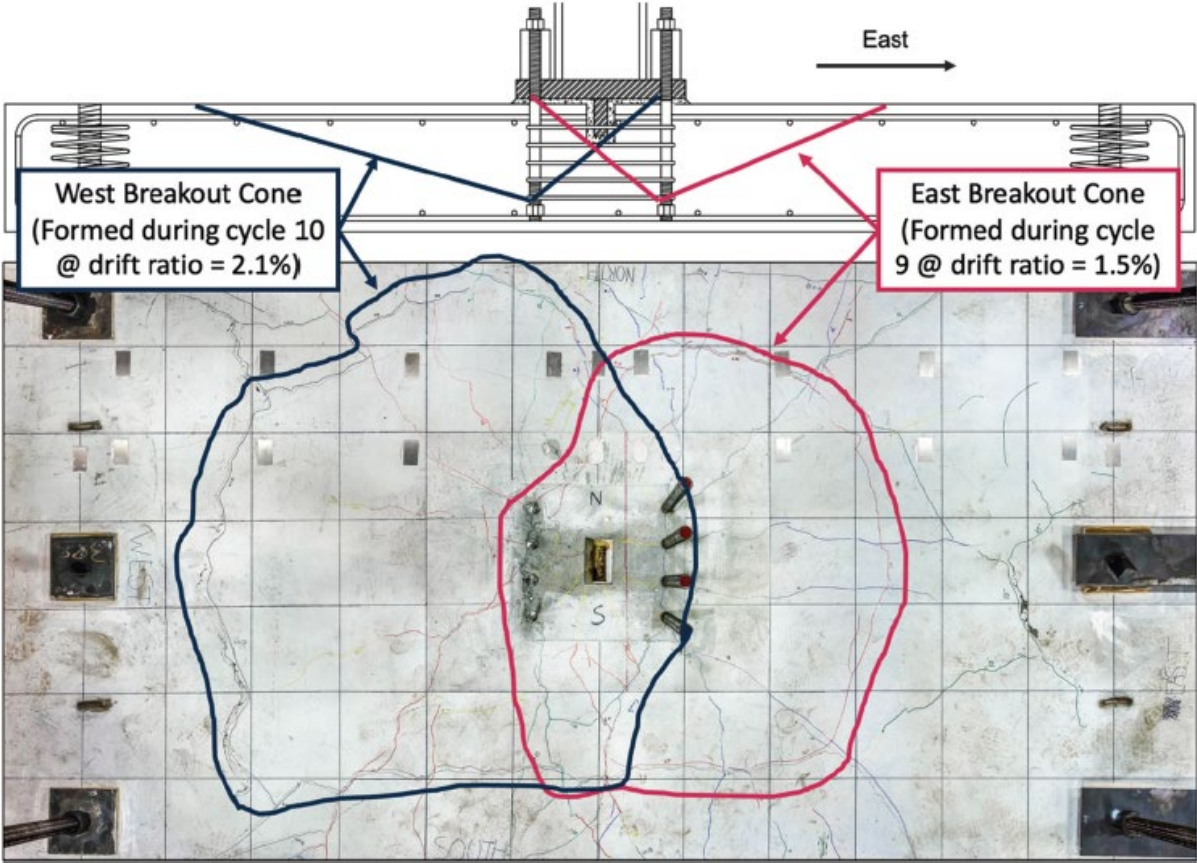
Idealized cone geometry shown in elevation and observed cone geometry intersecting top surface in plan view for specimen M01 (Worsfold et al. 2022)
